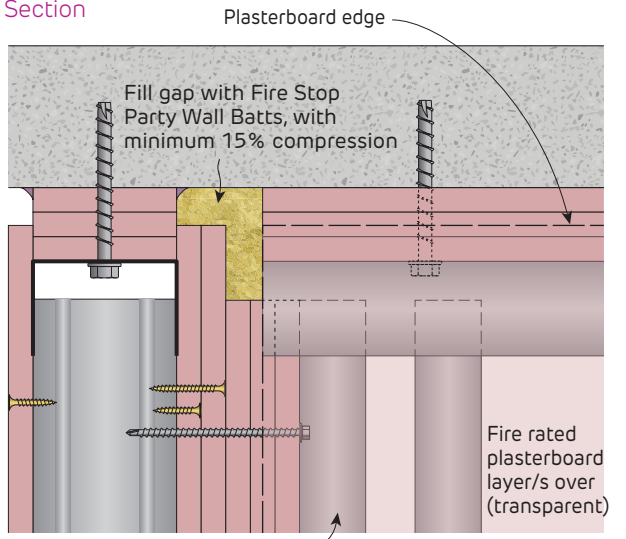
Sliding Wall End To Plasterboard Elevation
